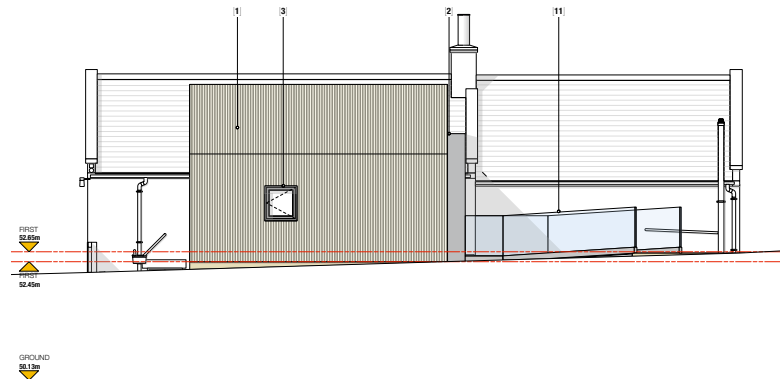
Extract from PL_003 Proposed Elevations and Sections: Sheet 2 showing the north-west elevation
